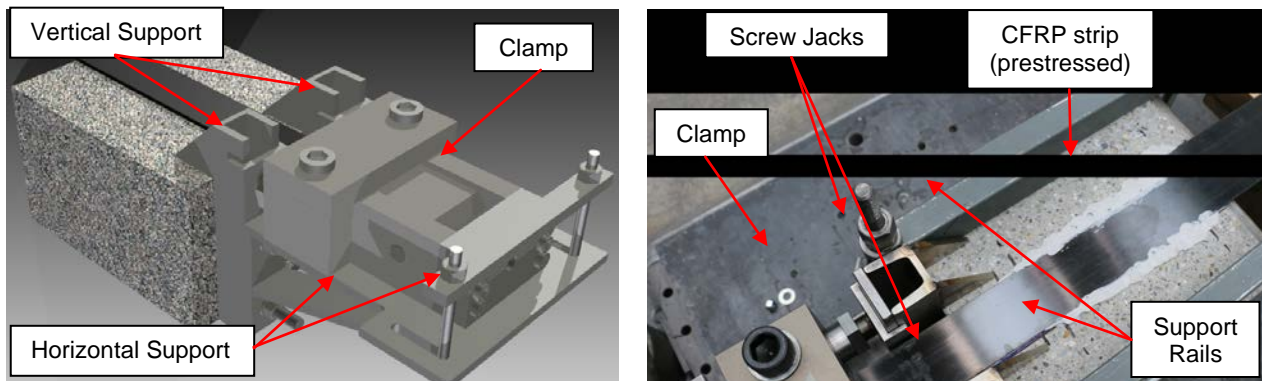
Novel Clamp and Specimen Design. (Left: Rendered Design, Right: Support Detail)
